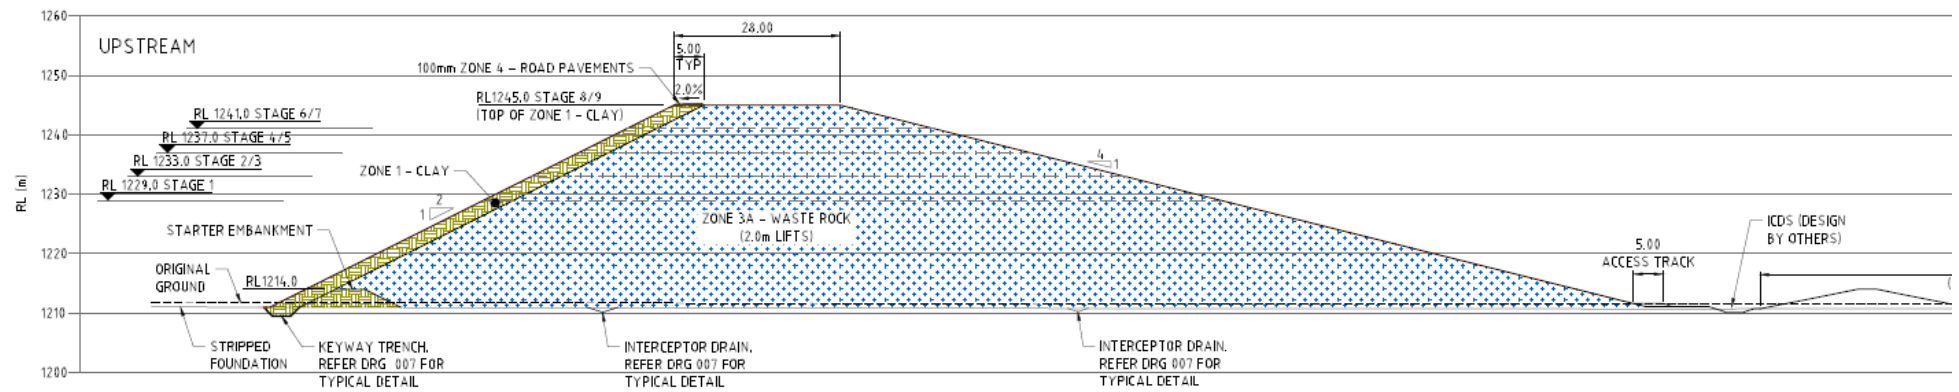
Northern expansion of IWL – typical embankment cross section
